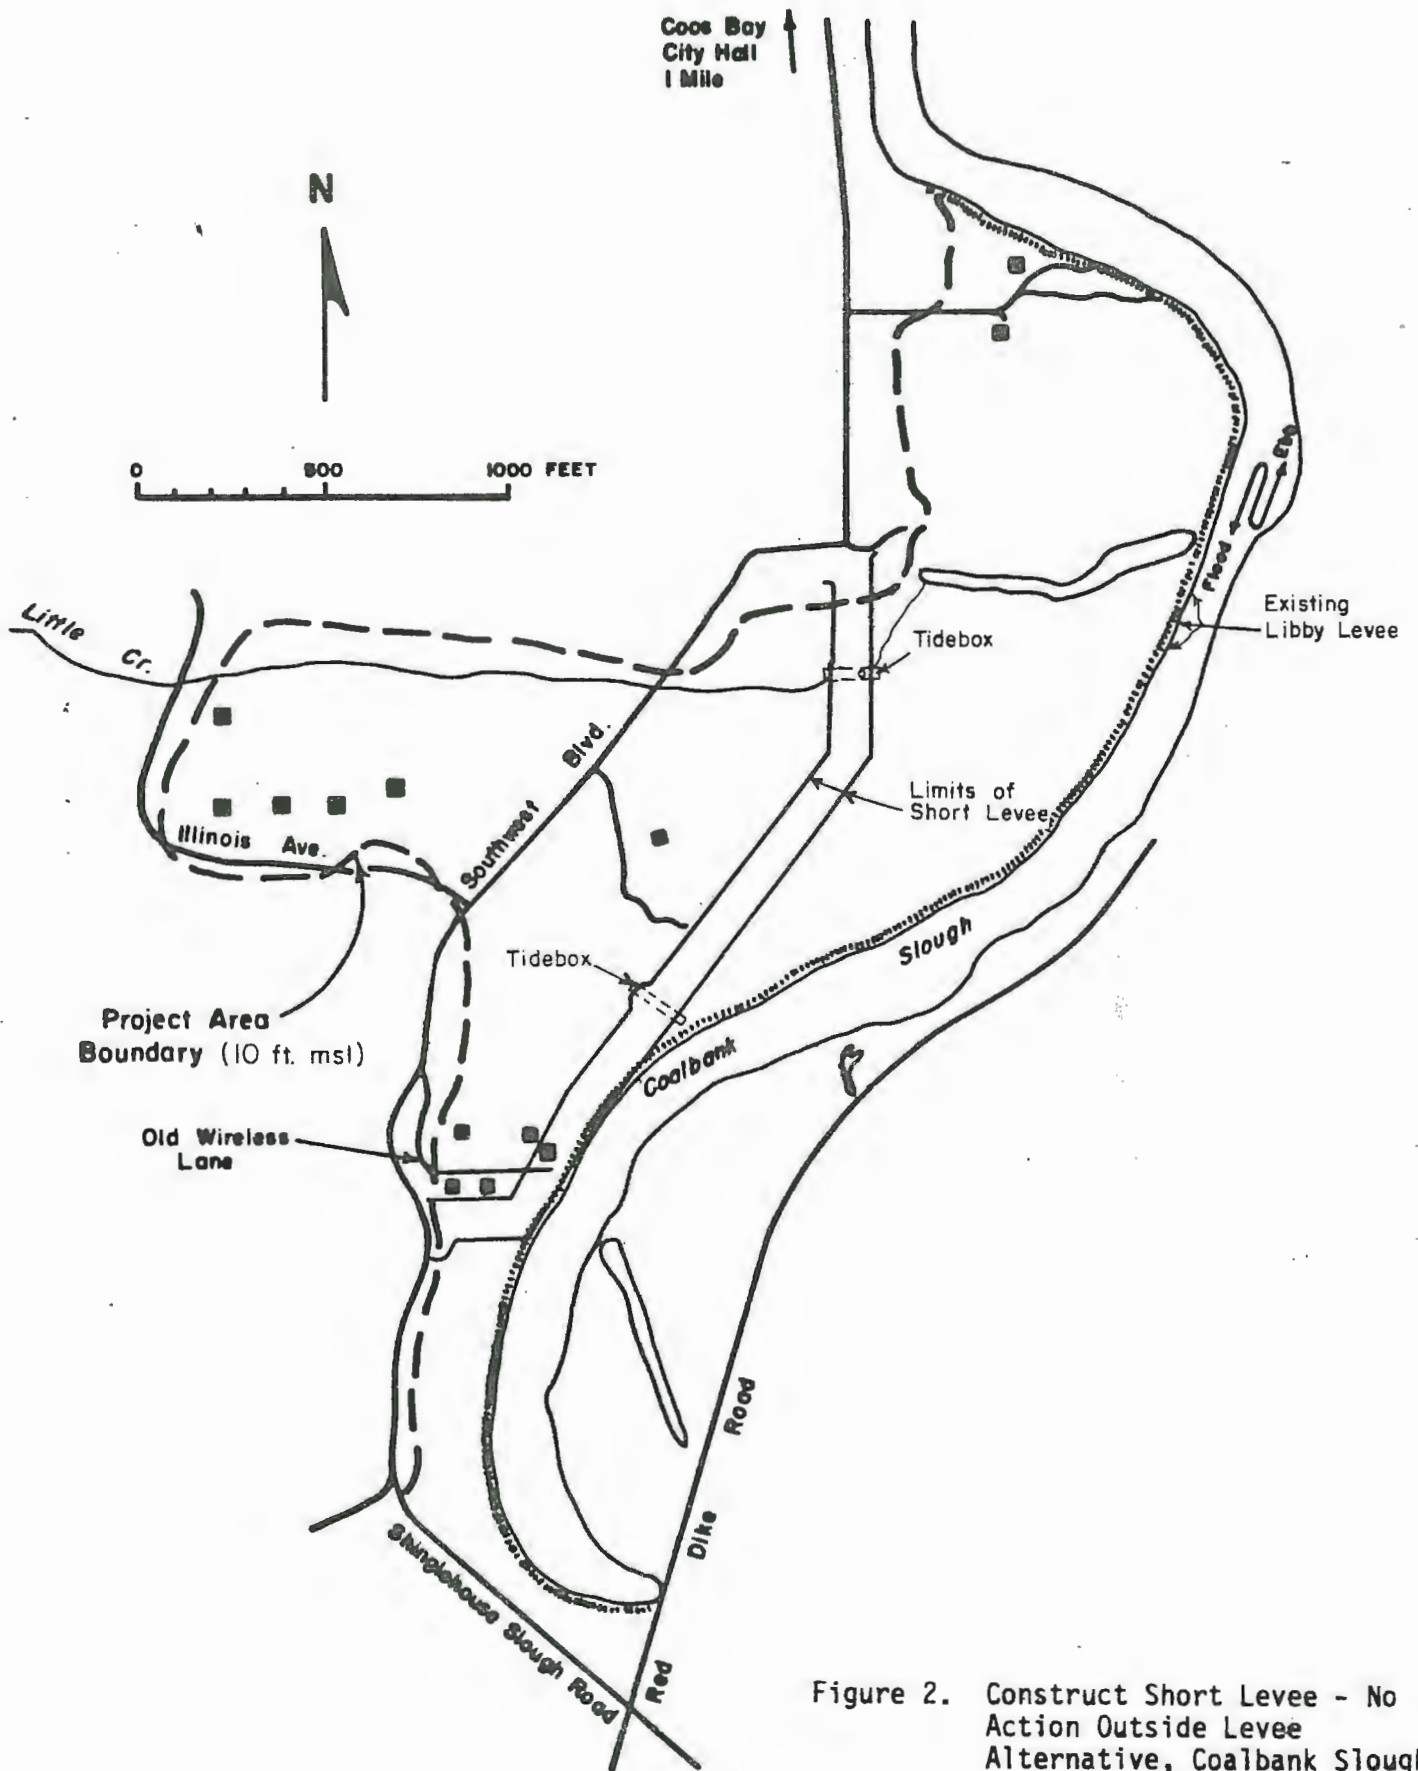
Construct Short Levee - No Action Outside Levee Alternative, Coalbank Slough, Coos Bay, Oregon.
